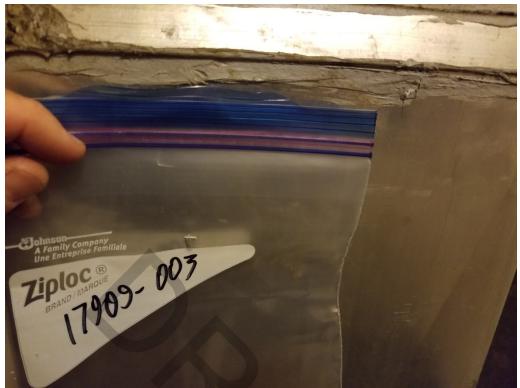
Grey duct sealant is ACM. (May 22, 2018)
